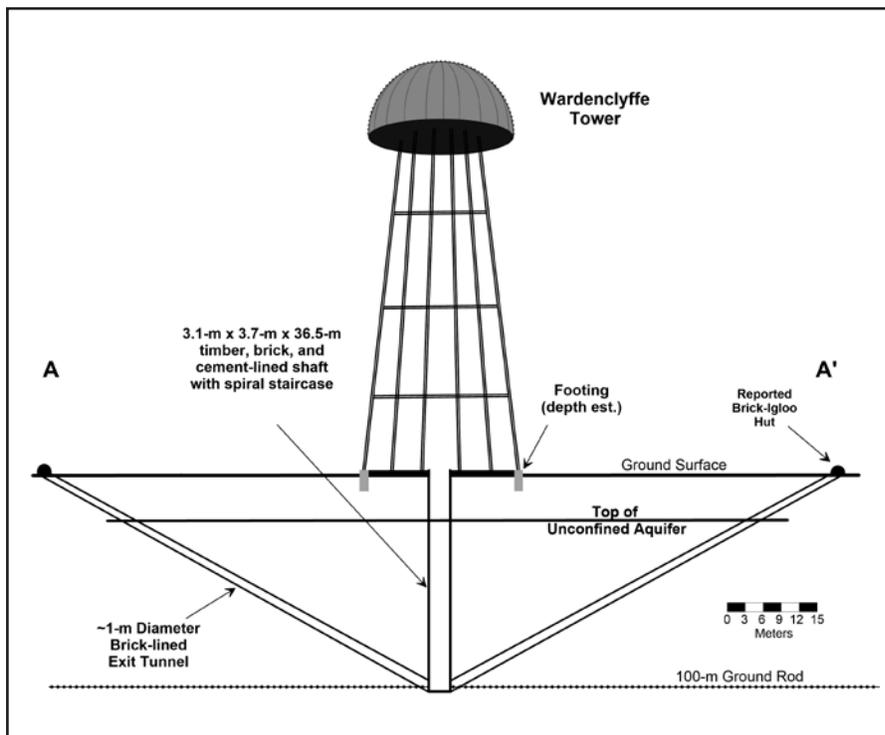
Cross section A–A' showing interpreted location of exit tunnels and vertical shaft beneath the Wardenclyffe Tower.
